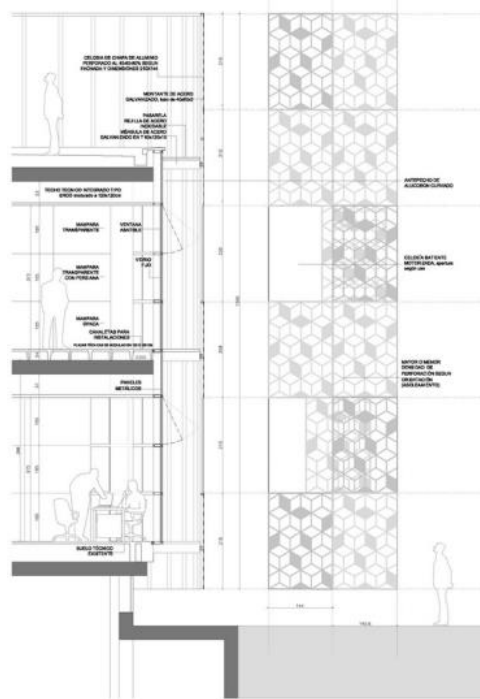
Facade detail showing glass facade and perforated geometric panels
